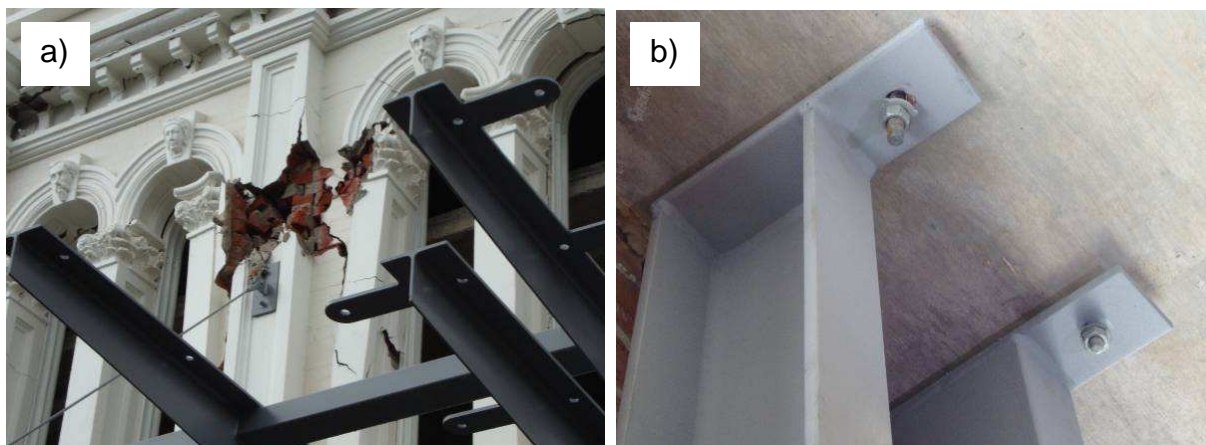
Example of earthquake damage caused by anchor failure during the 2011 Christchurch Earthquake: a) Historical masonry façade nearly collapsed due to insufficient anchorage to retrofit steel frame; b) Displaced anchors at footing of retrofit steel frame (Photos by J. Silva, Hilti North America / C. Mahrenholtz, University of Stuttgart)
